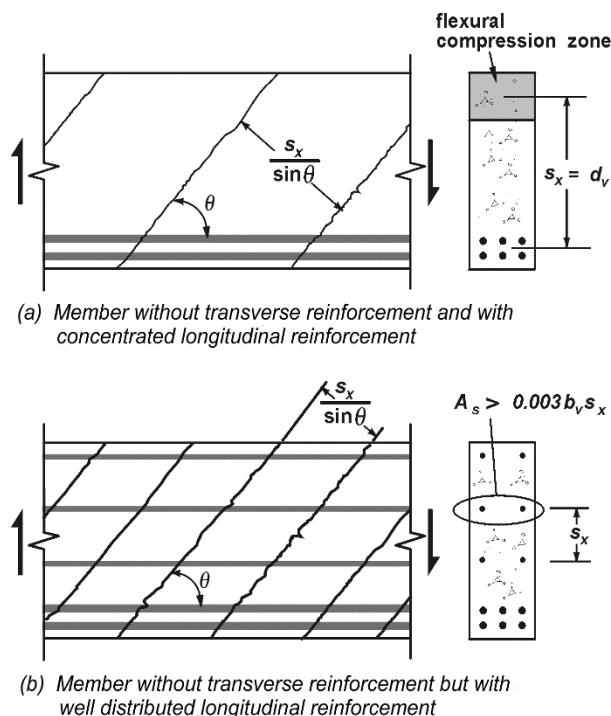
Definition of Crack Spacing Parameter, s_x
